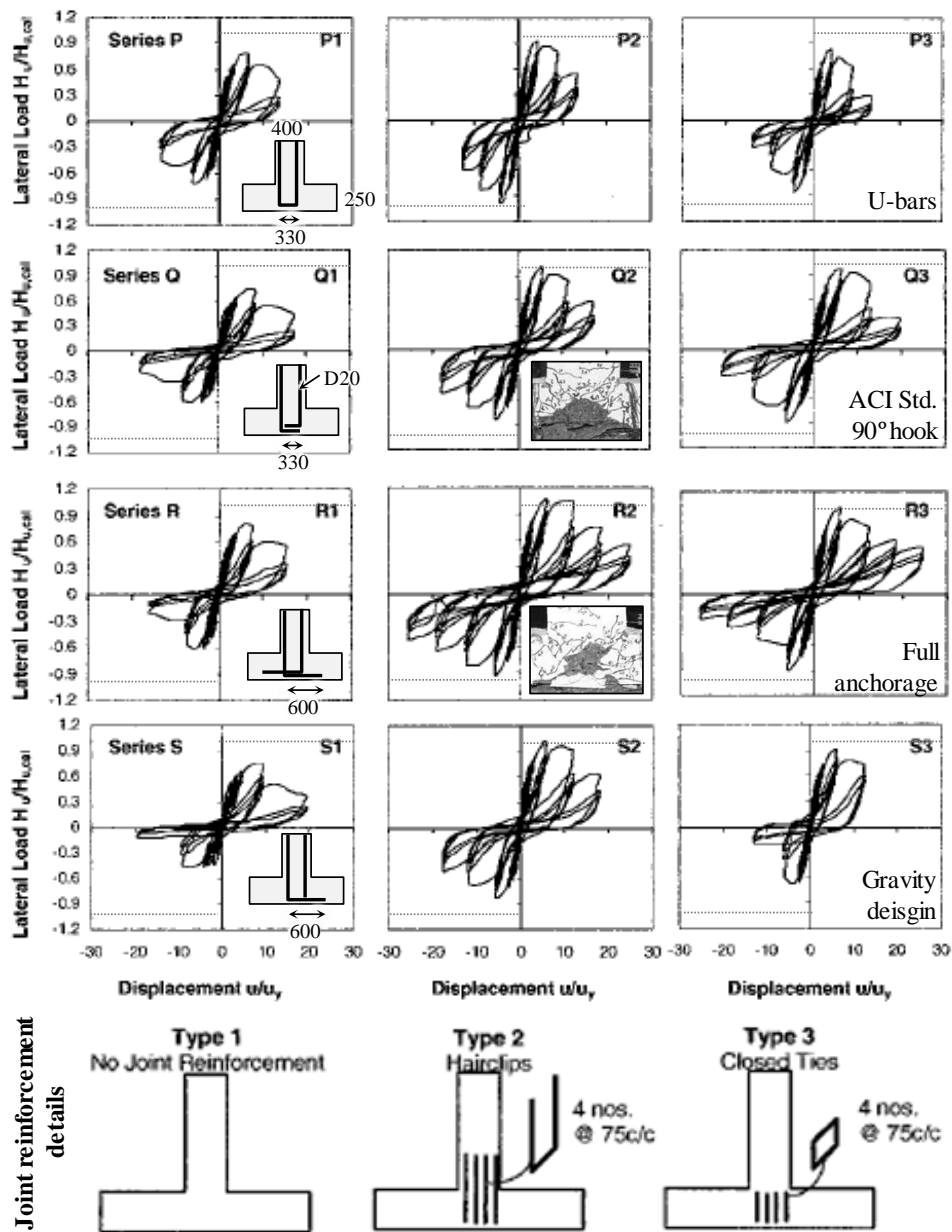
The effect of joint shear reinforcement details and anchorage details of beam bars in non-seismic exterior joints in the study of Murty et al. (2003)
